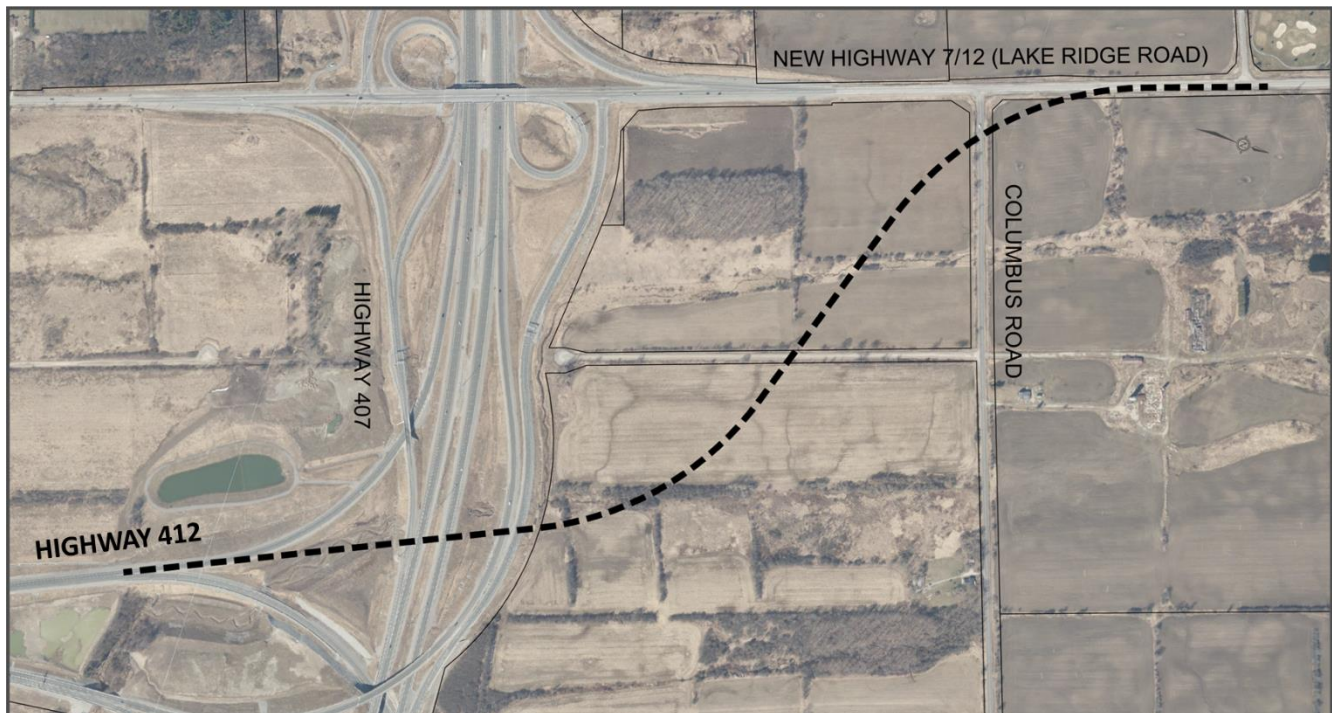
Possible Highway 412 Extension Northerly Conceptual Alignment
